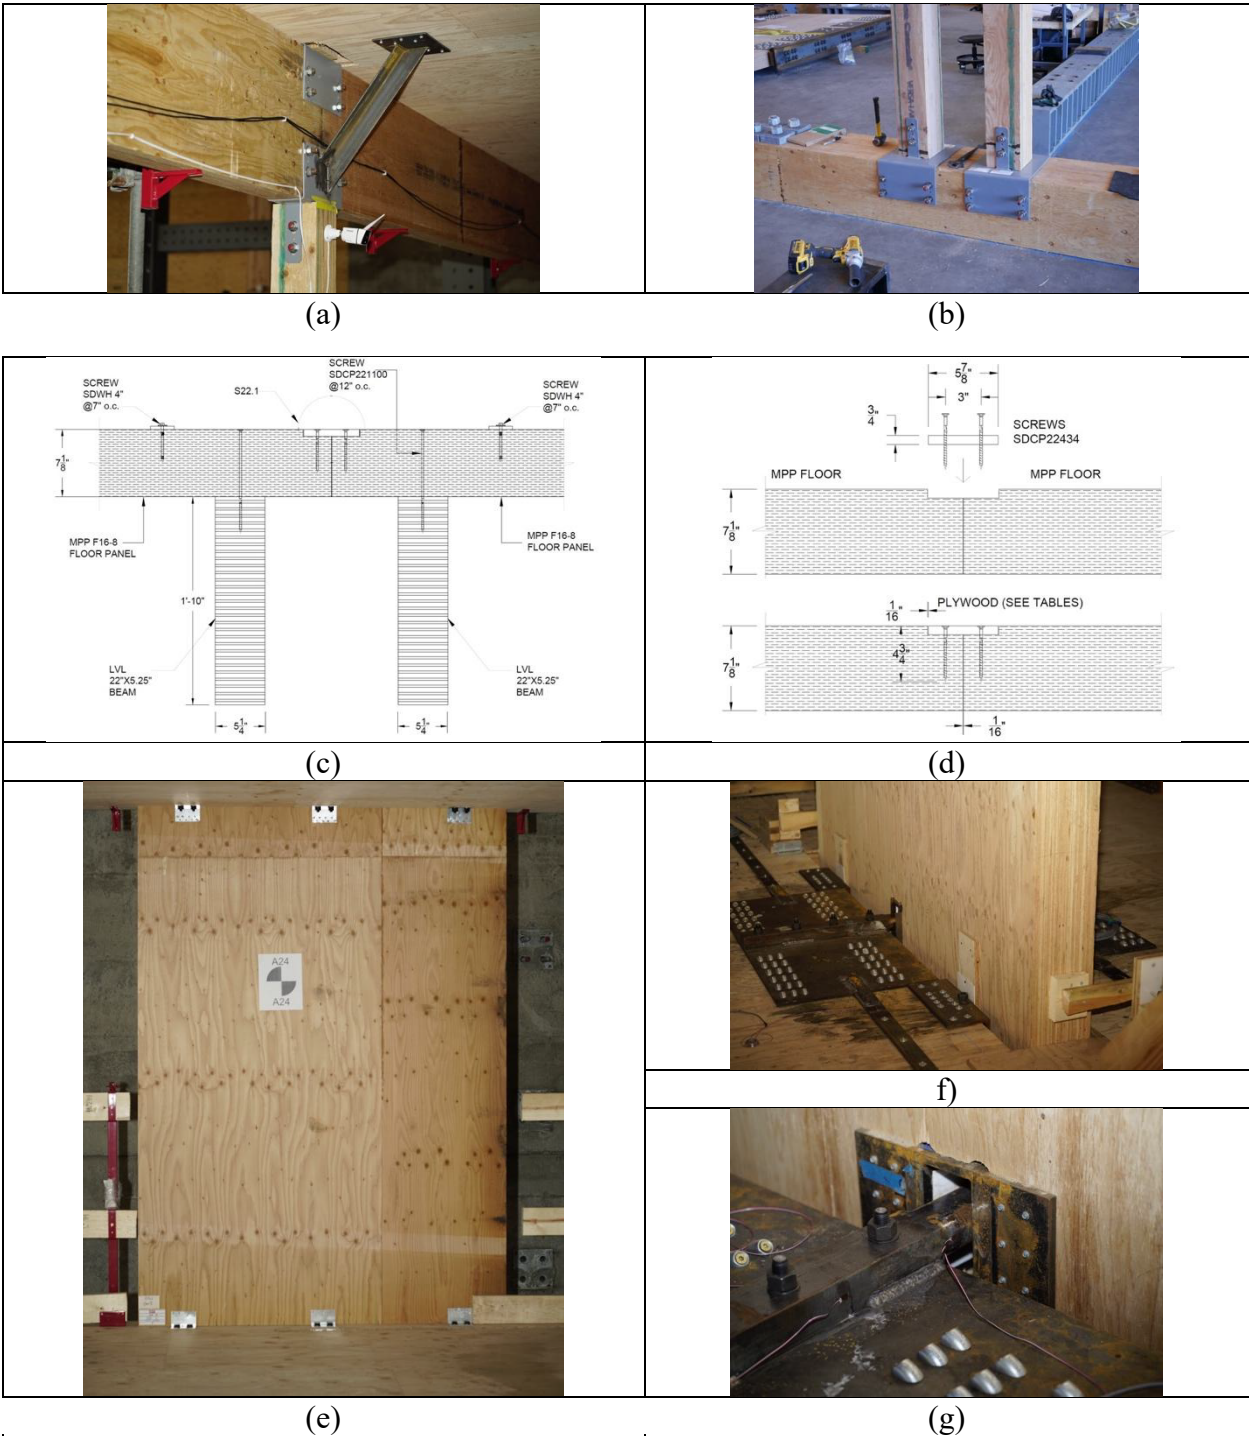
Building connection details: (a) beam-to-column connection; (b) column-to-foundation connection; (c) diaphragm-to-beam connection; (d) diaphragm spline connection; (e) out-of-plane wall connection; (f) shear transfer mechanism; and (g) steel window, shear key, wing plate and shear collector.
